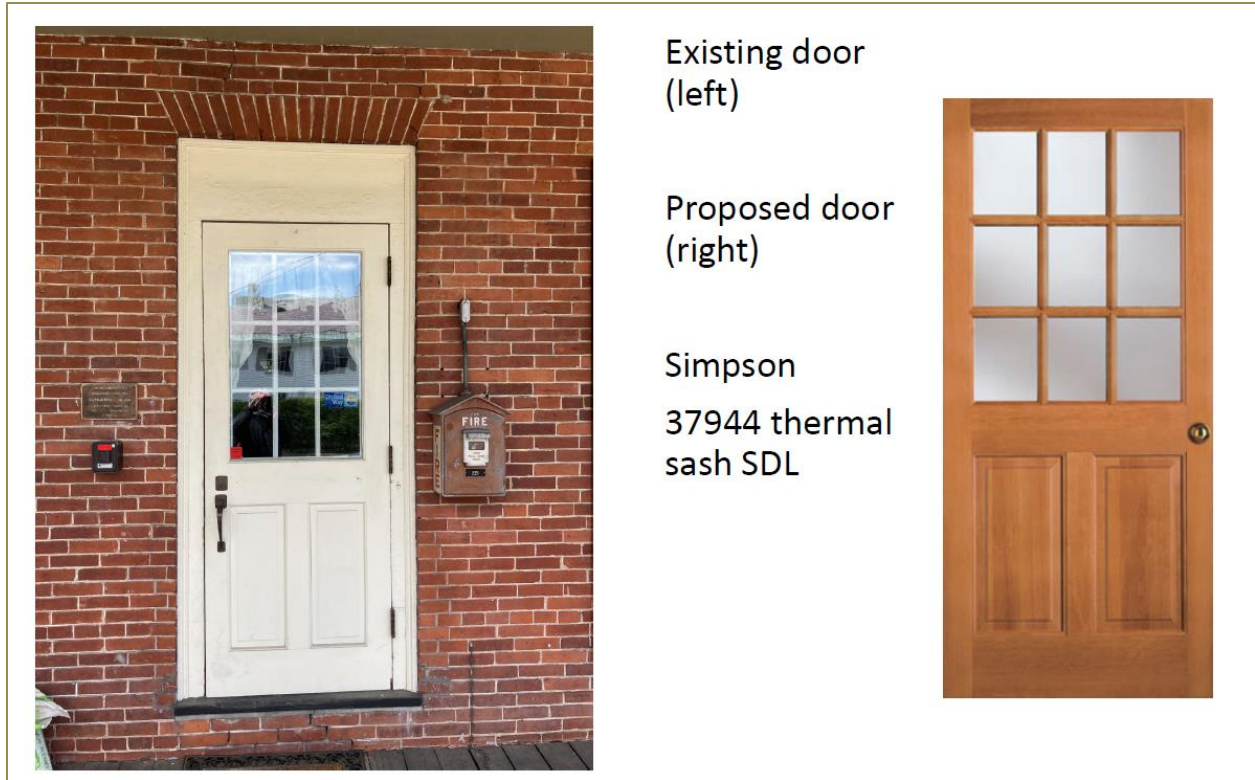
Image of the existing and proposed porch entrance door submitted by the Applicant.
